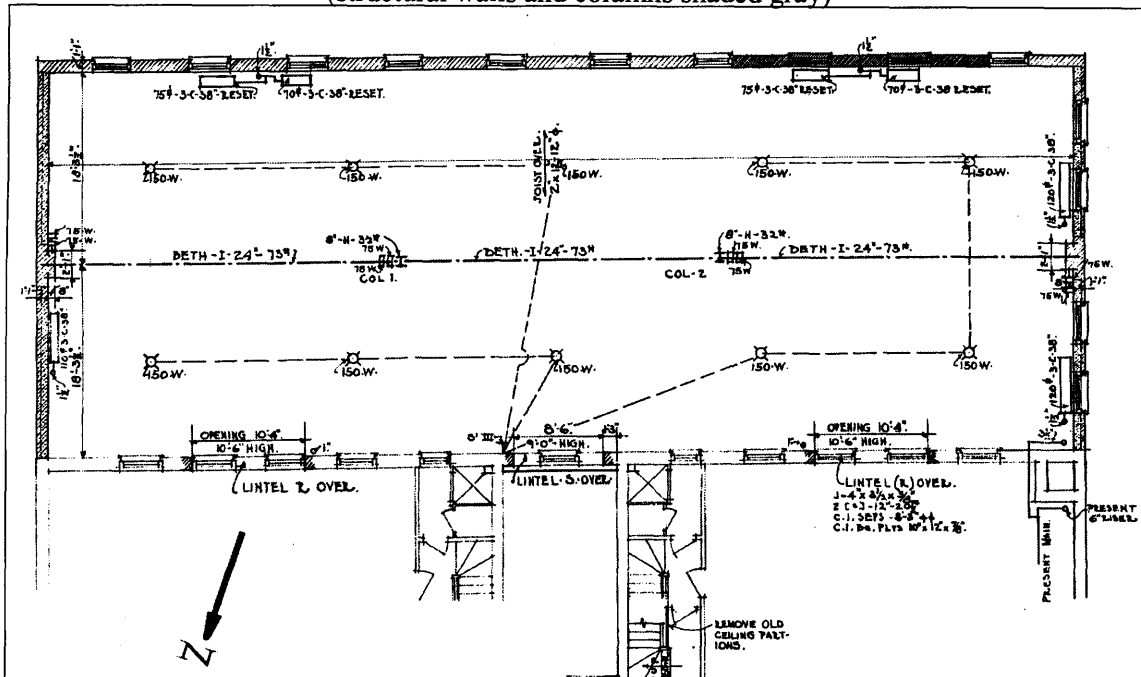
Historic addition second floor plan (Proudfoot, Bird & Rawson, architects, 1919)
